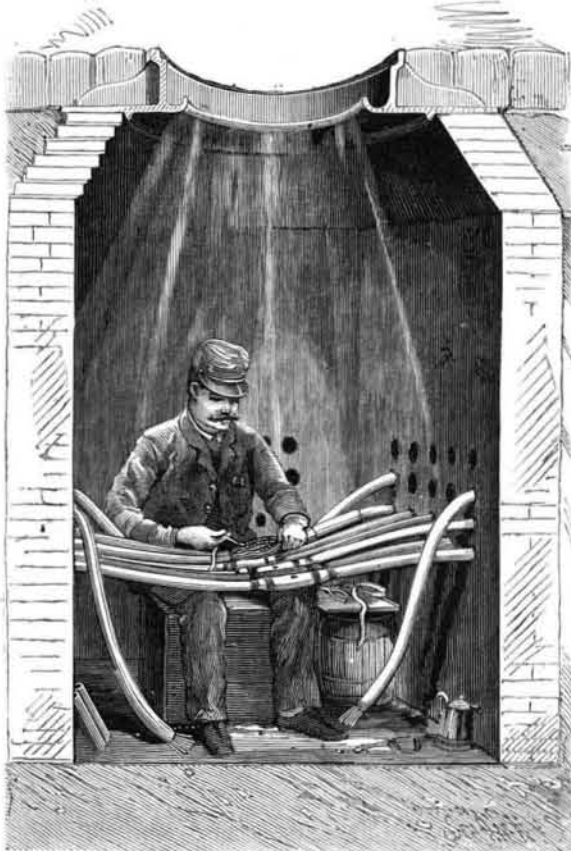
SPlicing WIRES AND CONNECTING CABLES.
